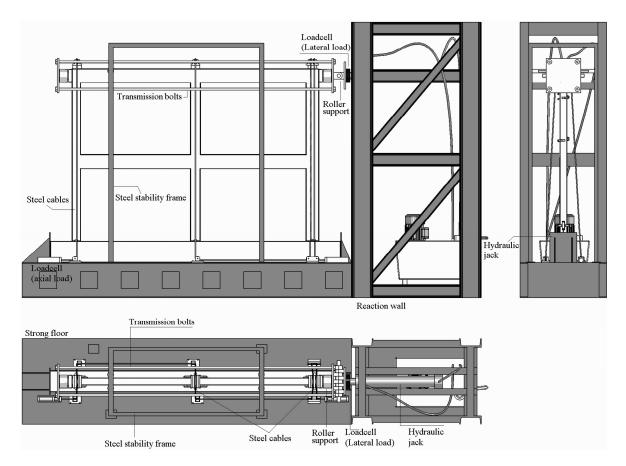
Loading system of the 1st group tests (Arslan, 2007; Kaltakci, 2008).
